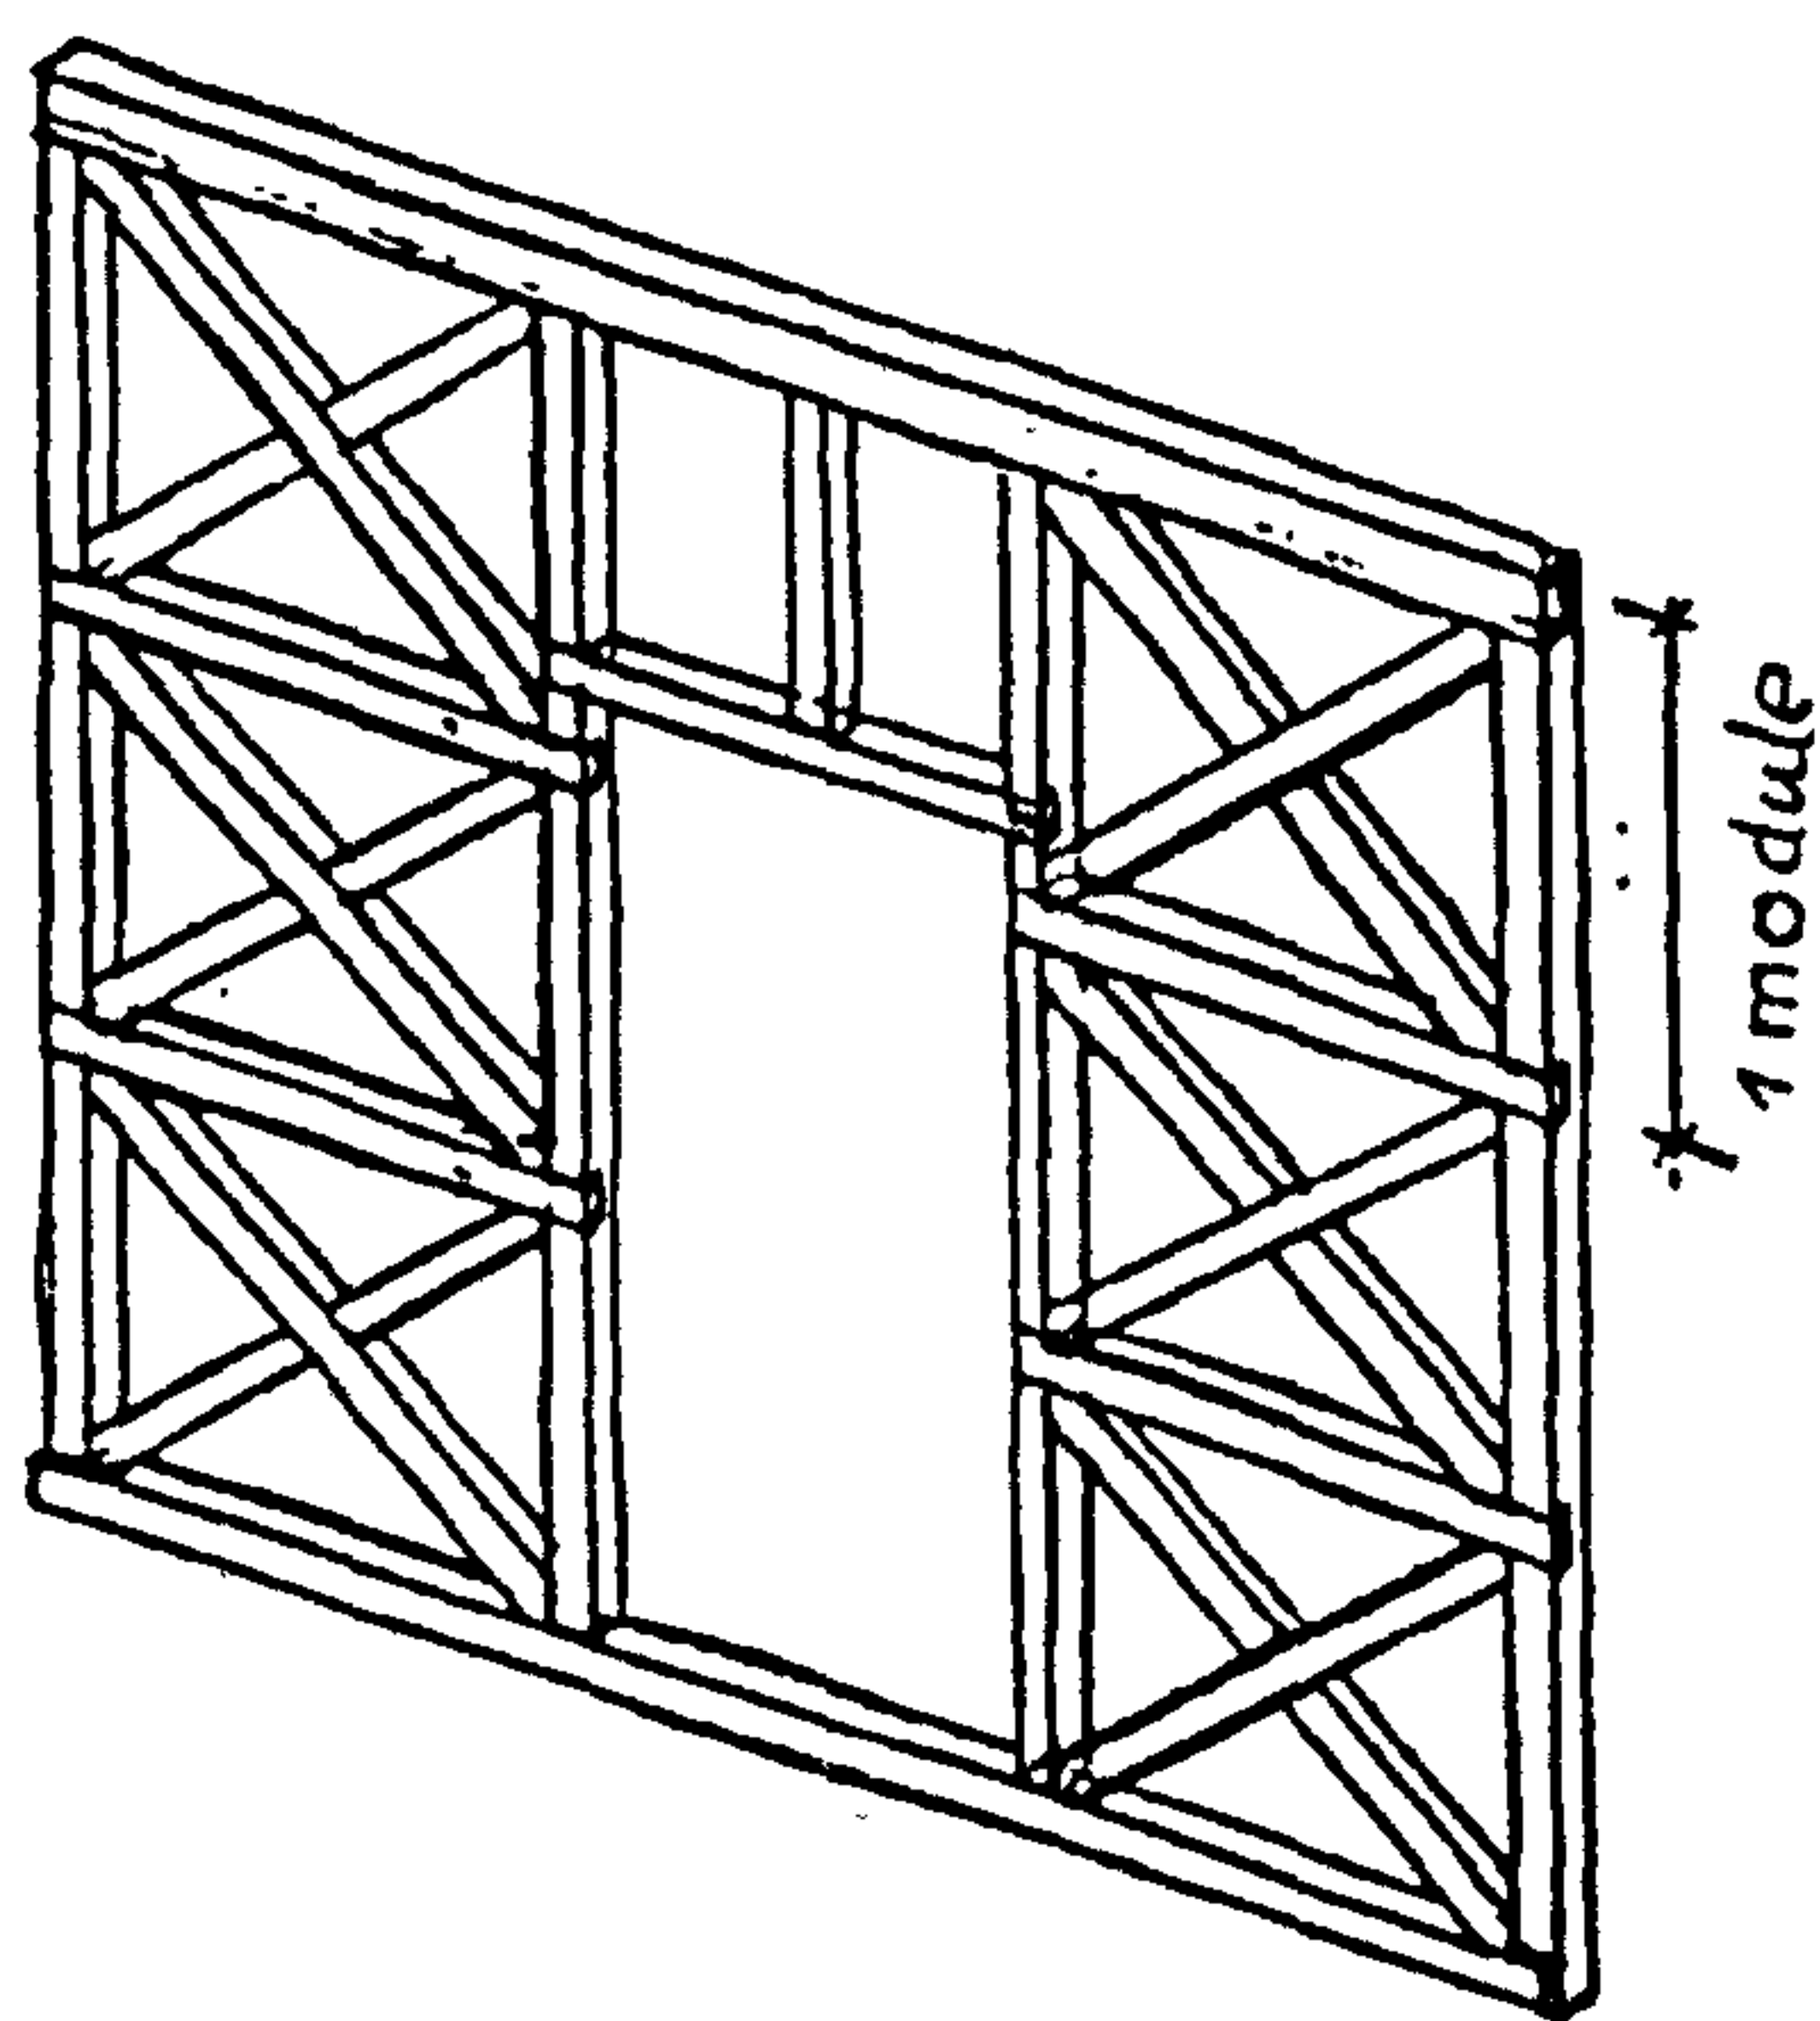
Part of panel of structure used on lower floors with three modules (building G)
